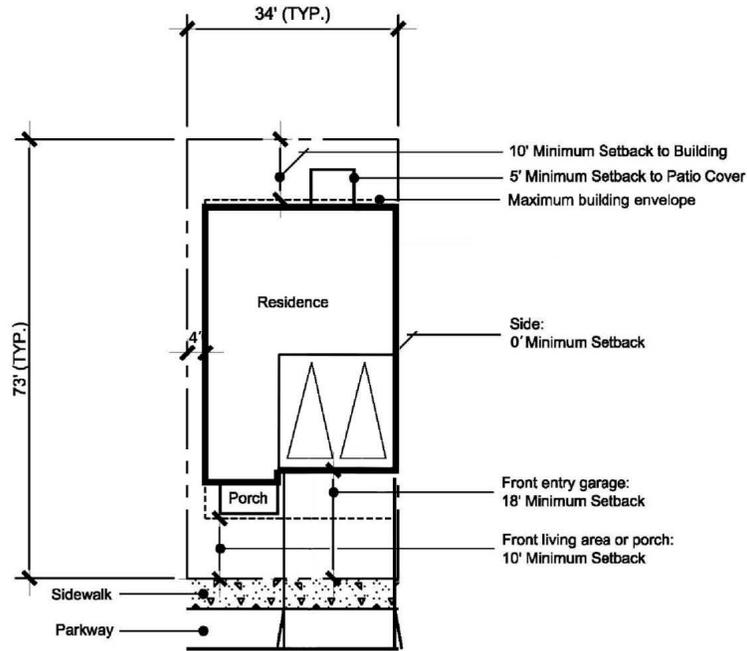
Village 2 Example with Typical 4' Side Yard Setbacks
